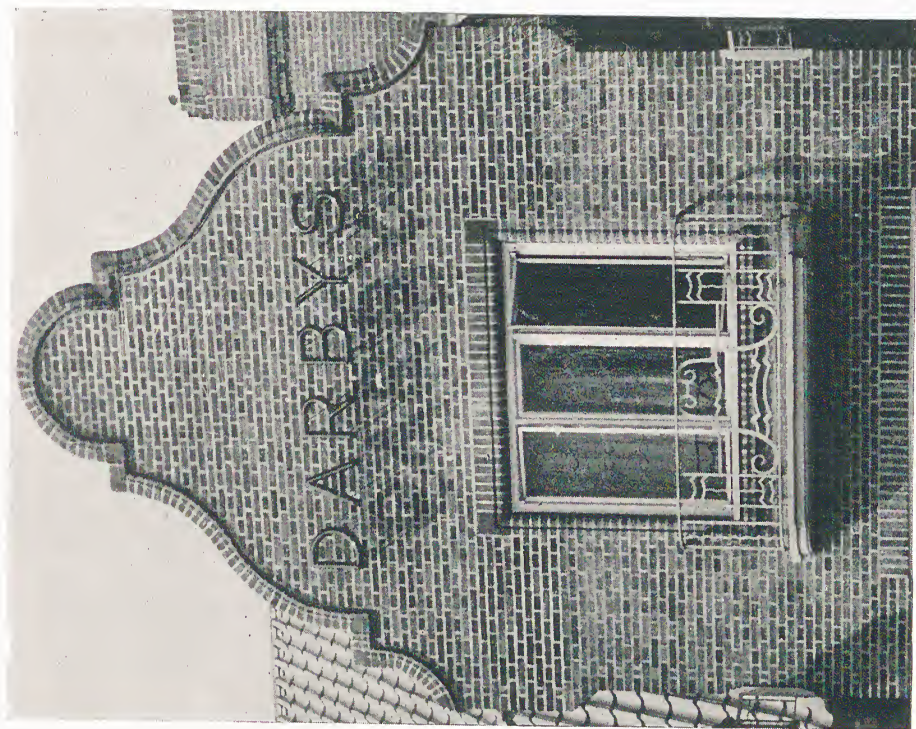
THIN SANDSTOCK FACINGS WITH MOULDED
